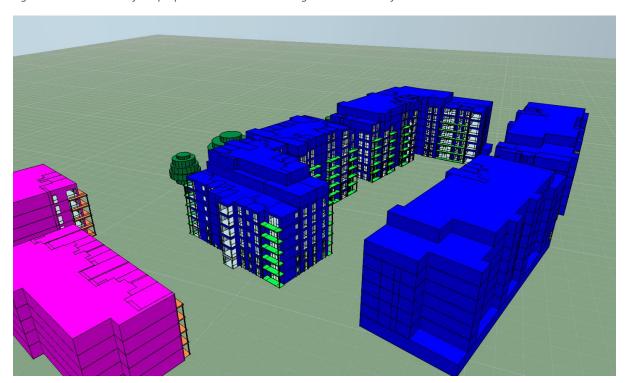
Aerial view of the proposed scheme with existing blocks from northwest
